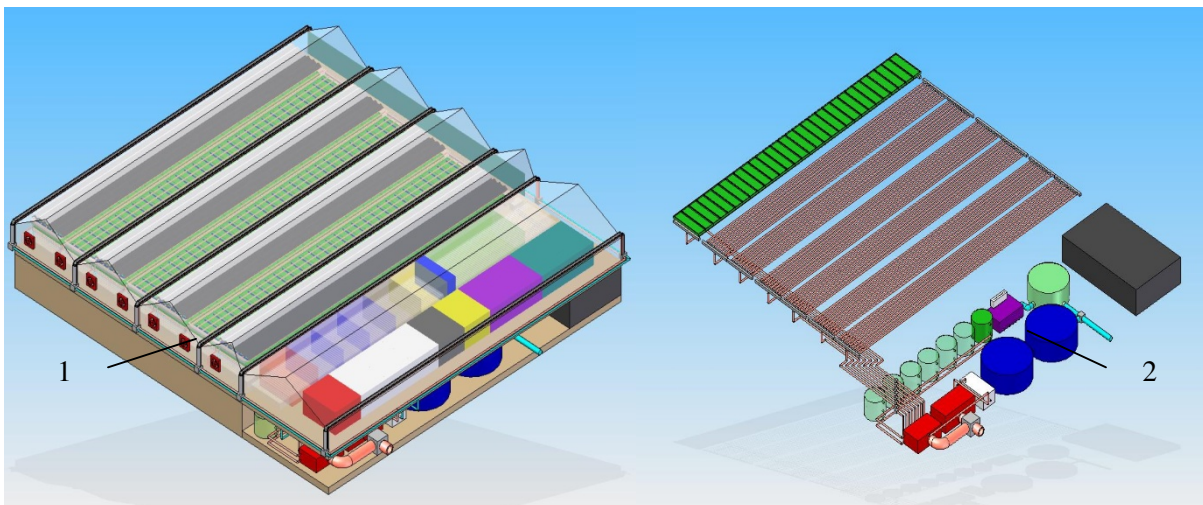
Greenhouse: 1 – plant complex; 2 – floor heating system
